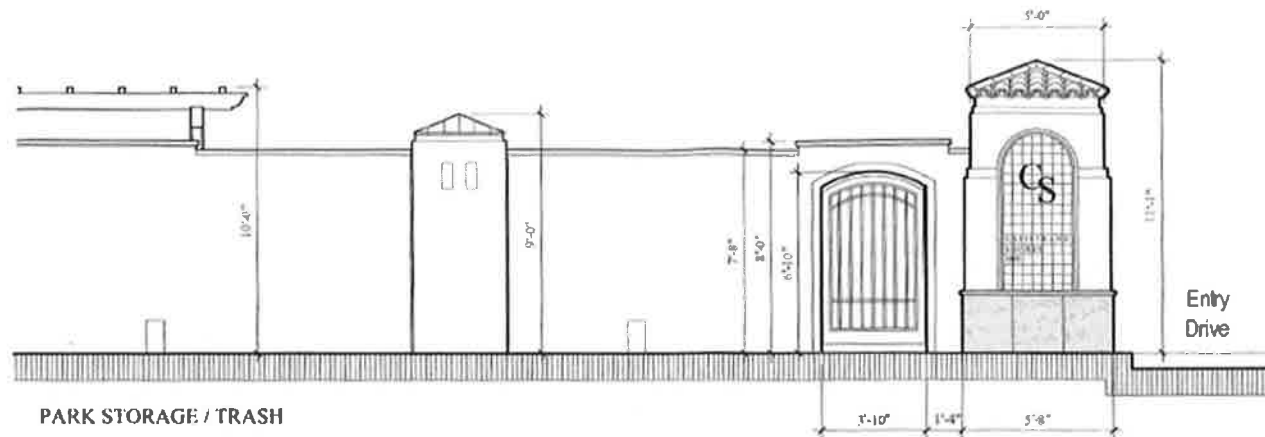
Proposed Entry Column with Trellis and Accent Column Detail
